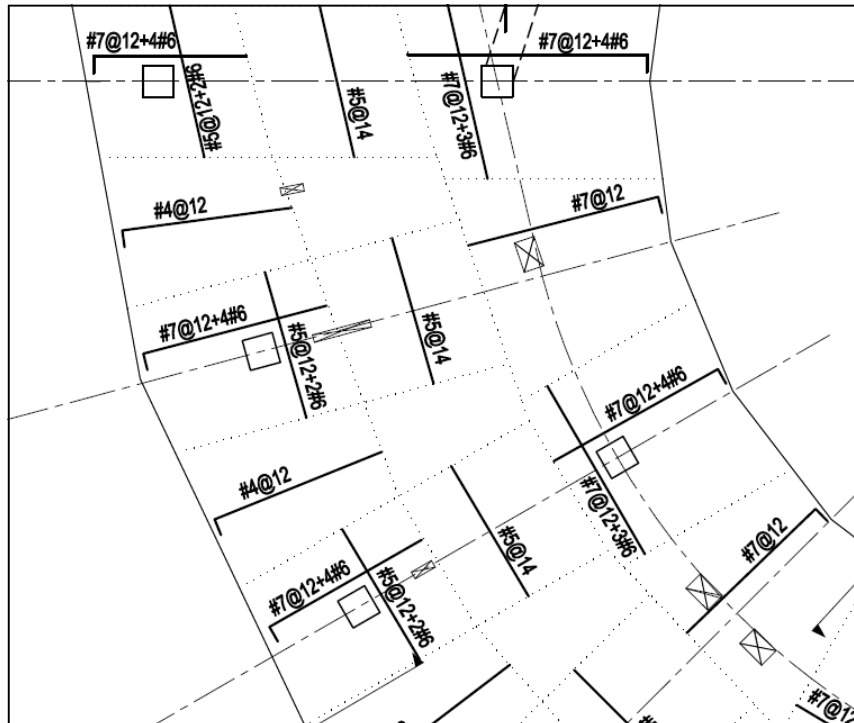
Original Gateway reinforcement. Courtesy RTKL.
